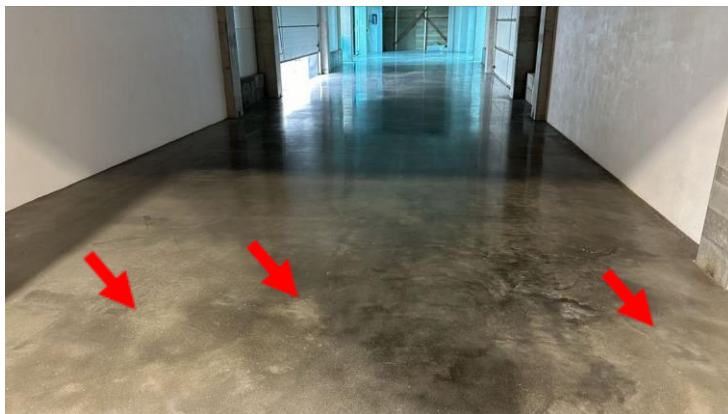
Concrete industrial floor (Example 3) before renovation: arrows indicate cold joints [38]
